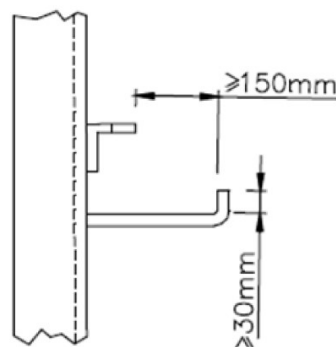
Minimum Dimensions of Step Bolts (Front View) [6,7]
